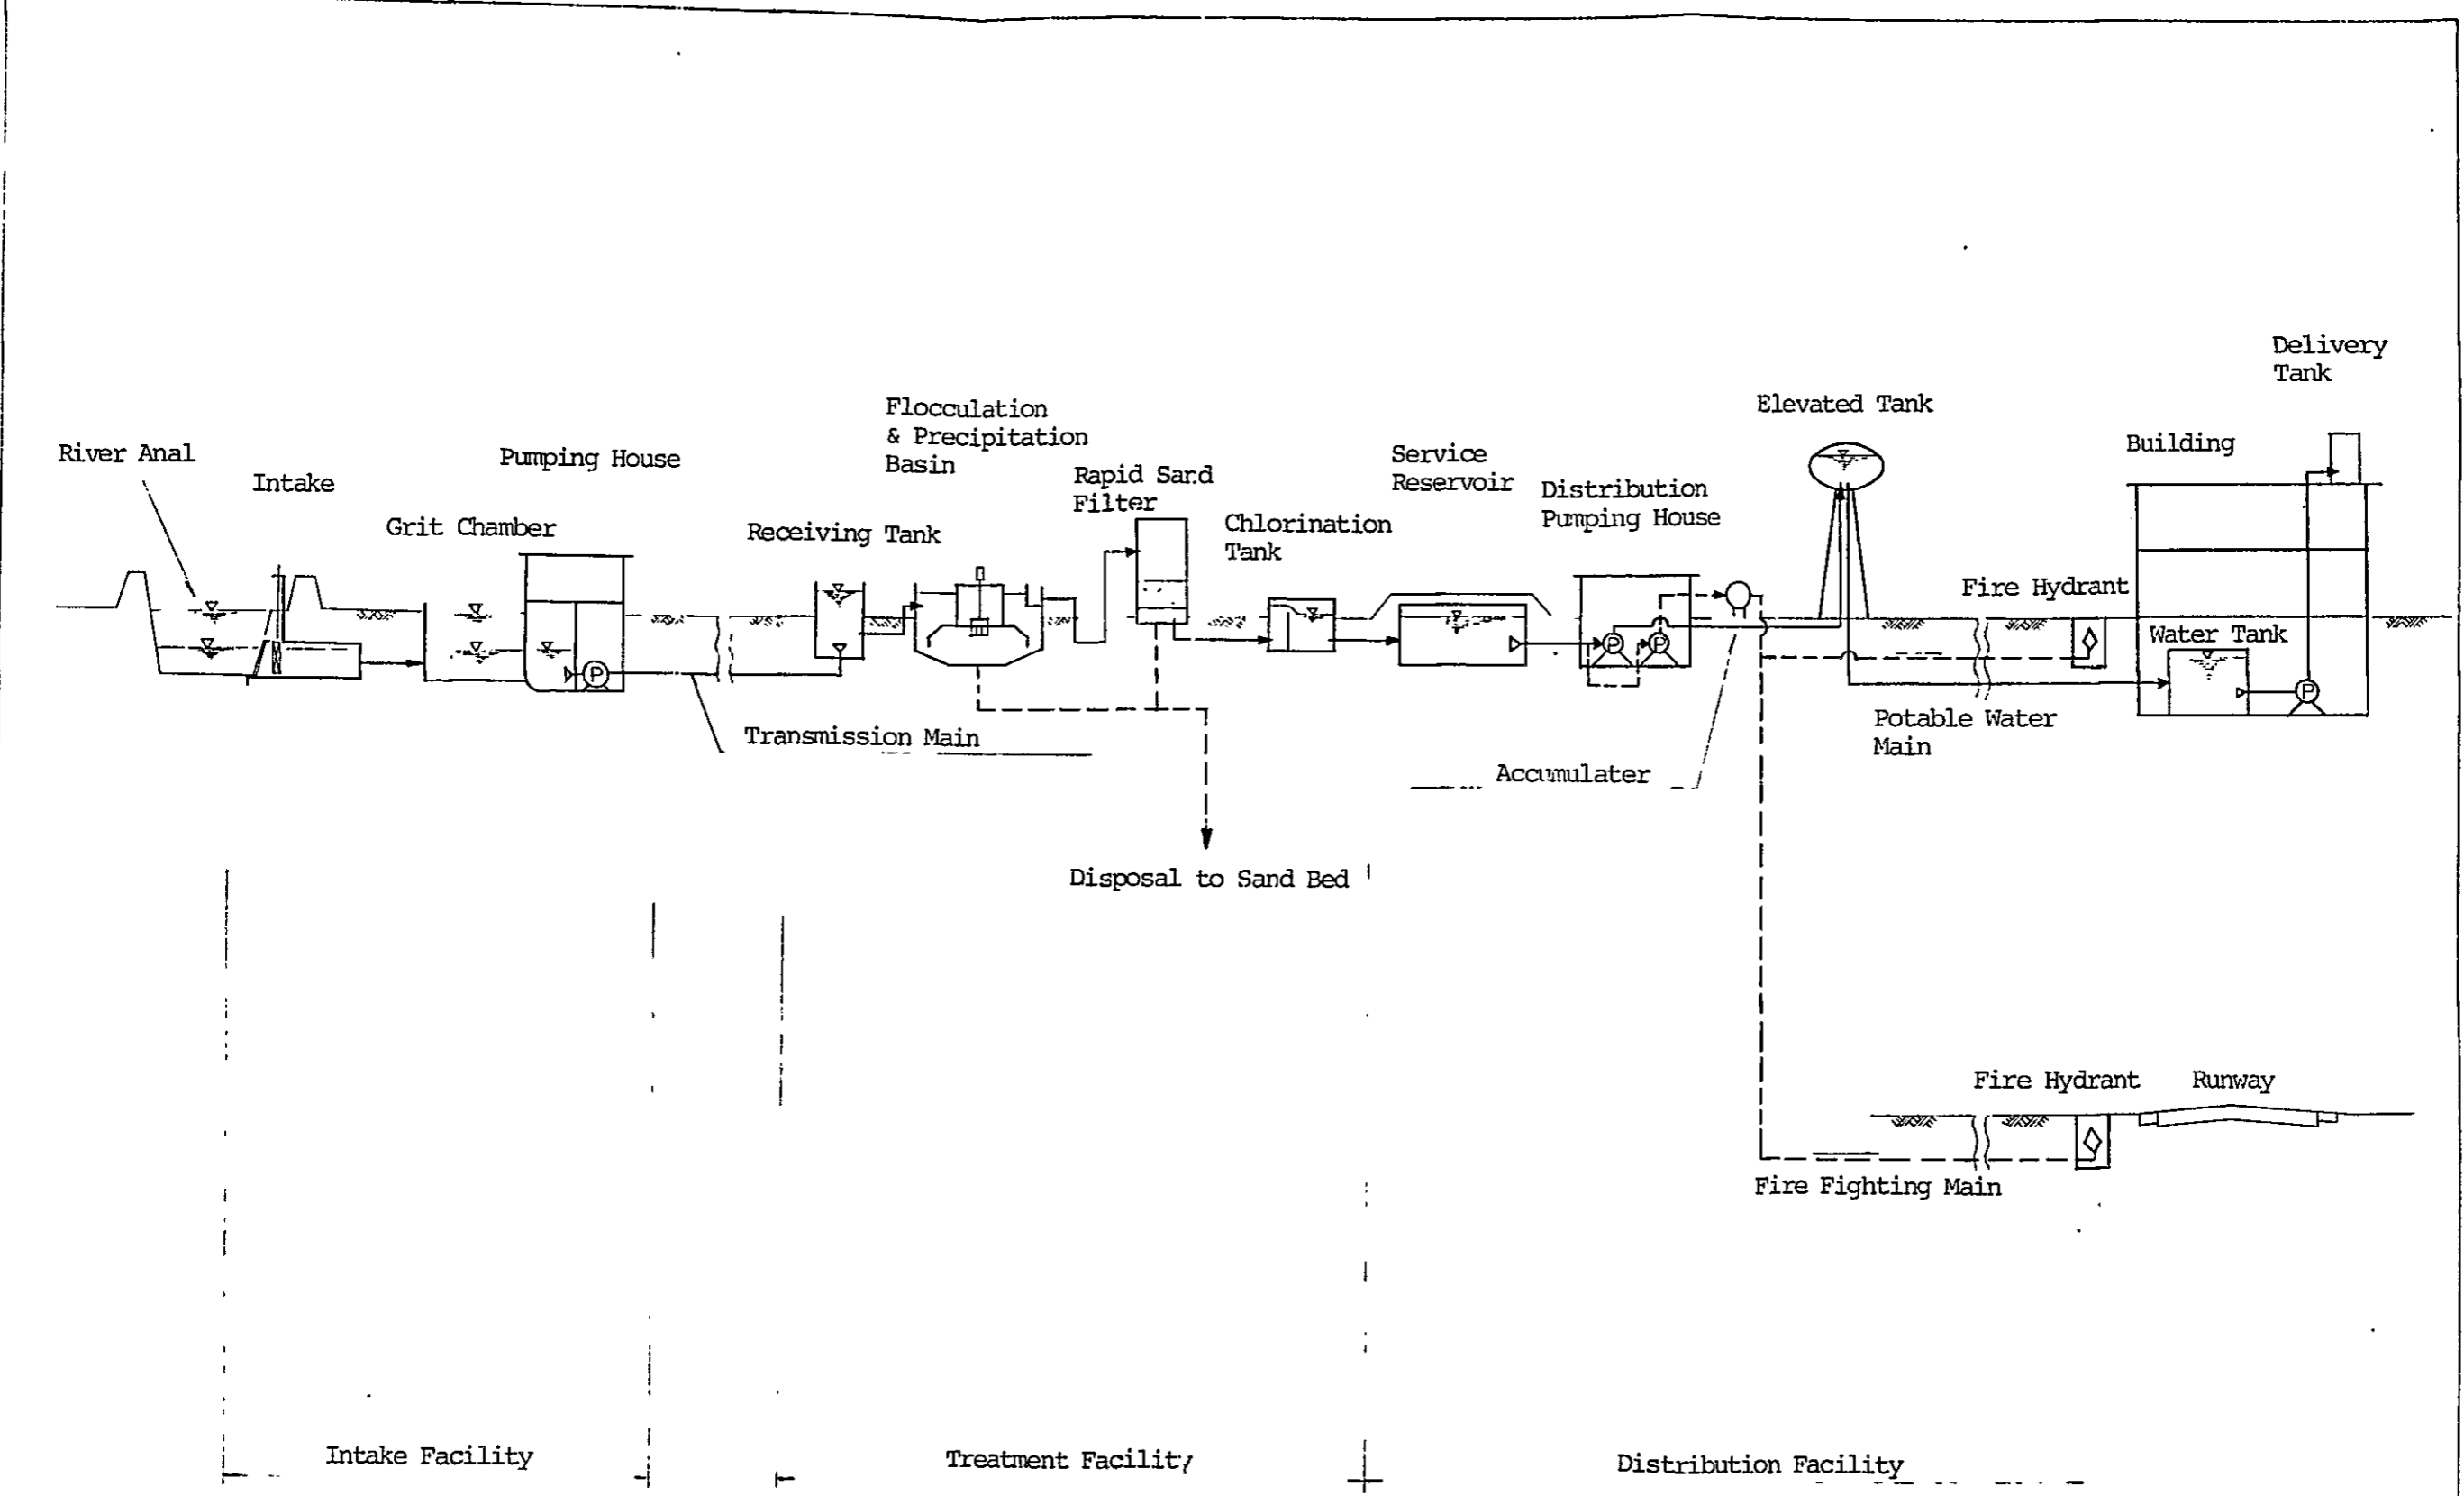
WATER SUPPLY SYSTEM PLAN
